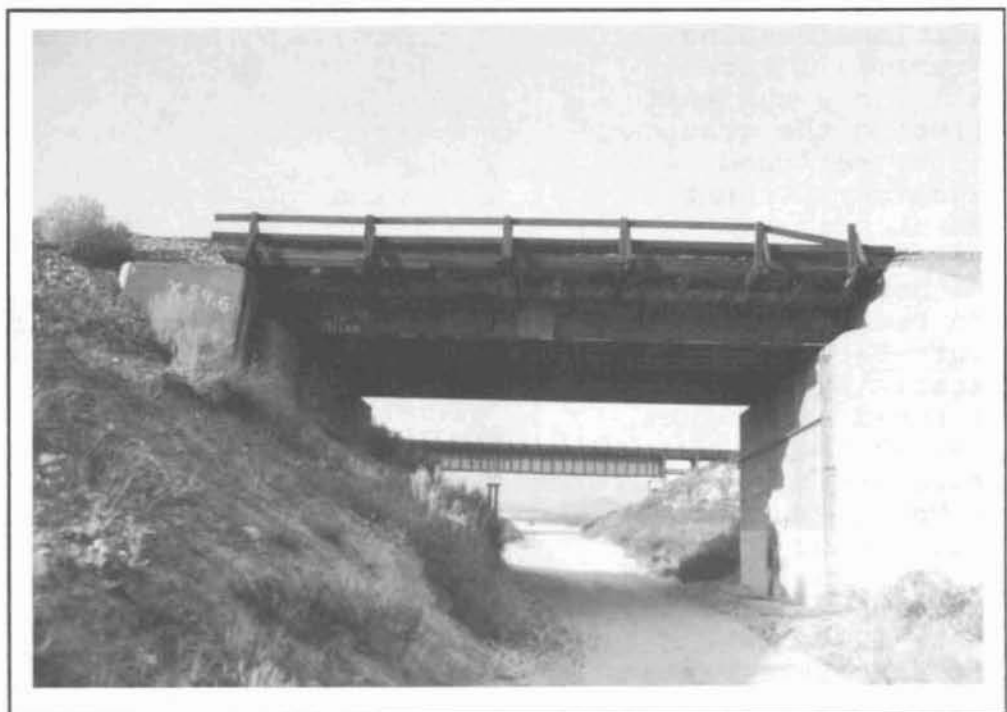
Typical Short Span Railroad Bridges North of Cajon Junction
